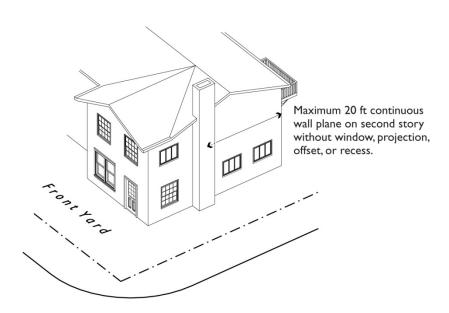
B(1): TWO-STORY DWELLINGS ON CORNER LOT
